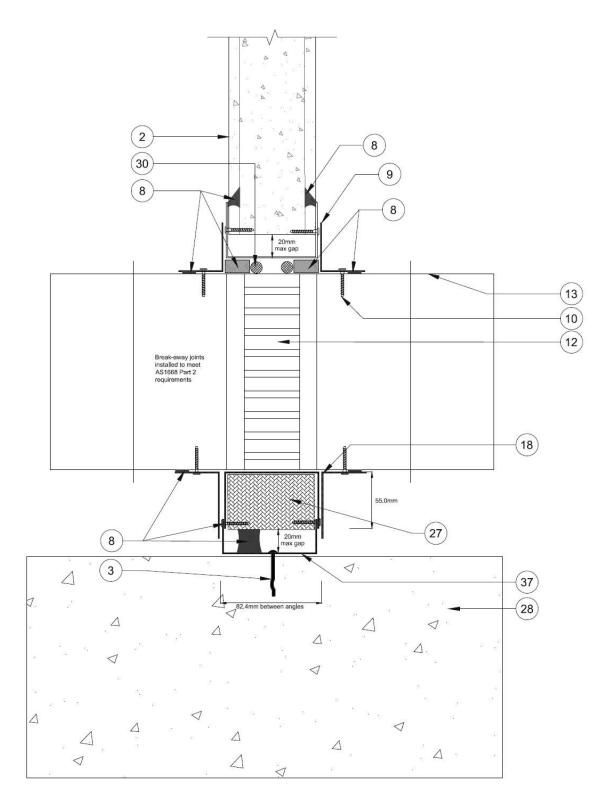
Kilargo Damper installation 55mm-75mm from base of wall
